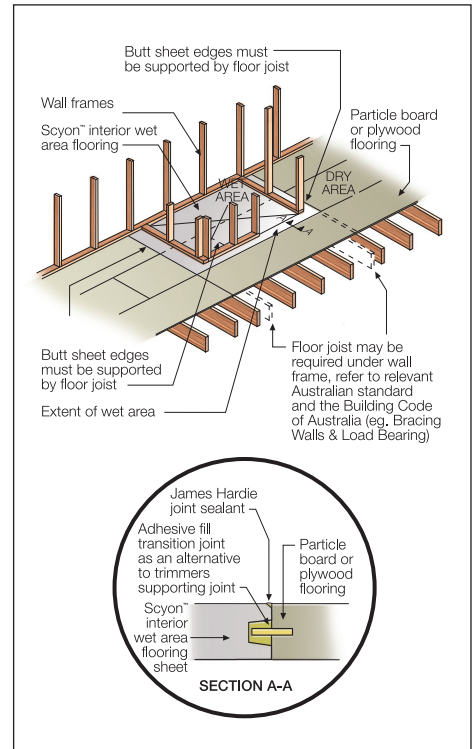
B OPTION 2 - INSTALLING SCYON SECURA WET AREA FLOORING BEYOND EXTENT OF WET AREA (TO SUIT SHEET LAYOUT)
